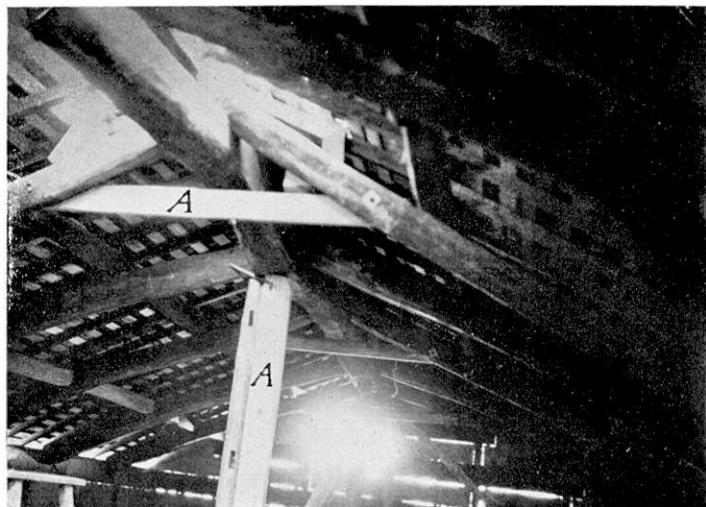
The roof construction. The member A has been added for reinforcement after the earthquake.
